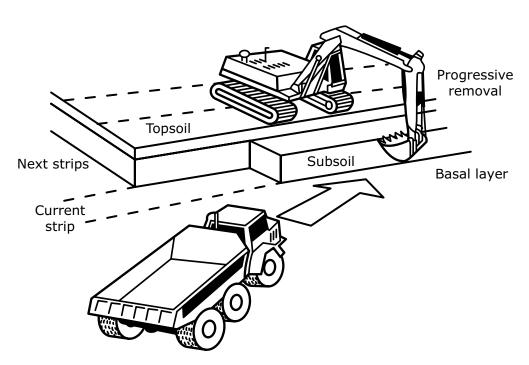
Stripping with excavators and dump trucks: removal of subsoil from a strip.
